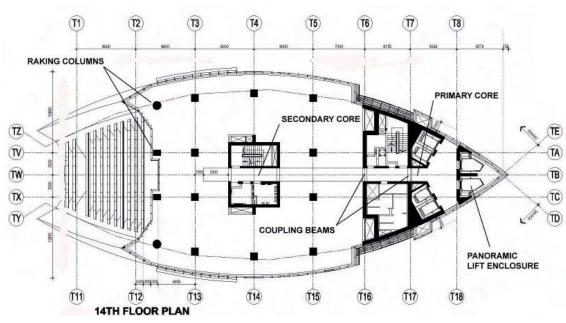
TYPICAL TOWER FLOOR PLAN
